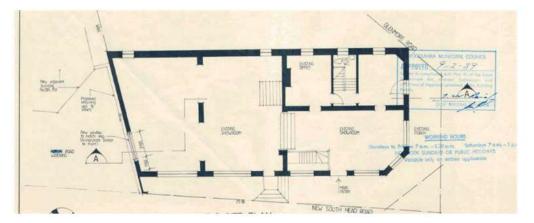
DA1988/1029 & BA1989/52 which approved a new window opening to the eastern wall. This floor plan most accurately reflects the current internal layout of the ground floor level.
